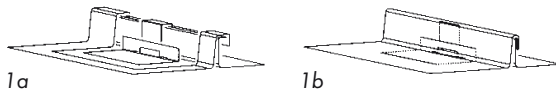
to 1b: Forming a double standing seam by using roll formers – manufacturing process
